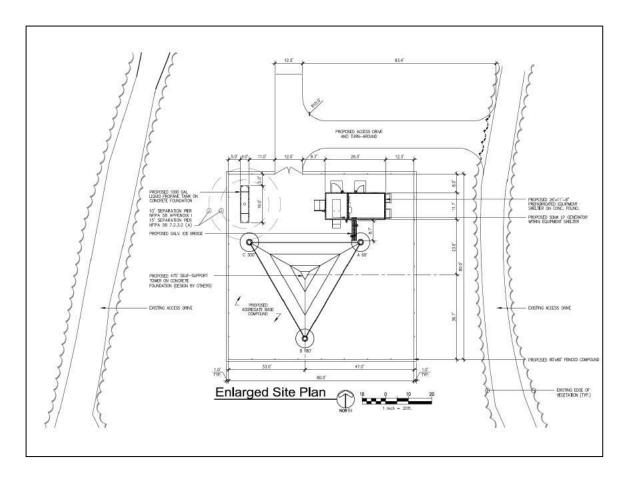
Detailed schematic of proposed project area (Trileaf 2018).
